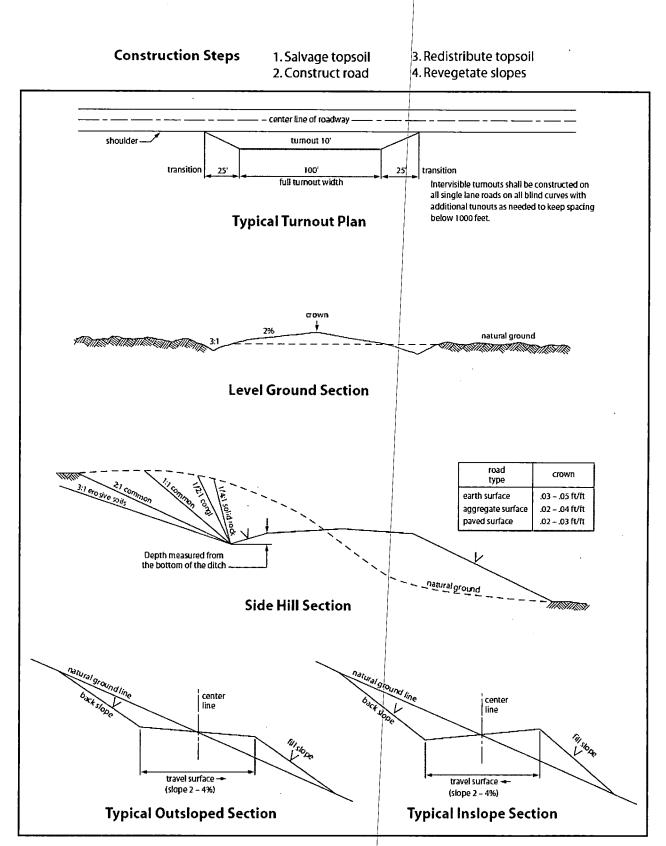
Cross-sections and plans for typical road sections representative of BLM resource or FS local and higher-class roads.
